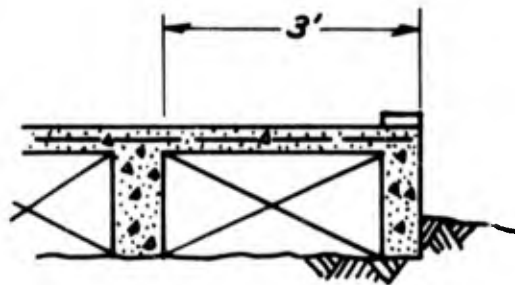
Typical details for slabs-on-ground of types shown. (a) Typical reinforcing.
